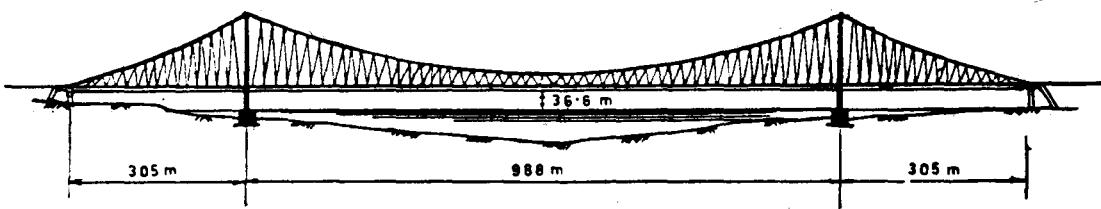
SEVERN BRIDGE (WALES) (O'Connor)<sup>6</sup>
